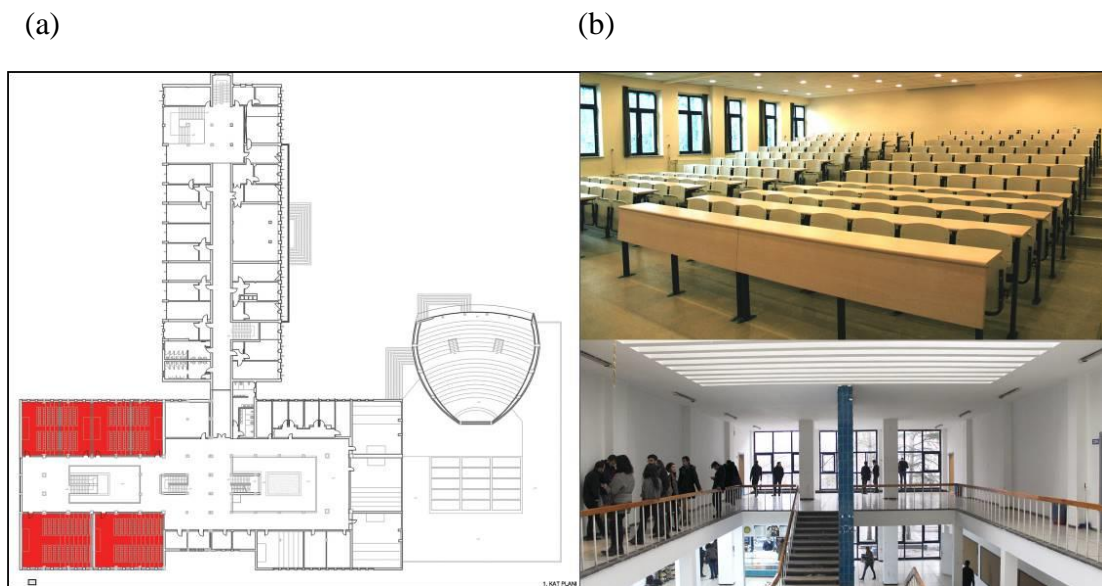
Location of dormitory rooms on the first floor (a) and views from the first floor and classrooms today (b) transformed from dormitory rooms (Azize Elif Yabancı, 2017)
